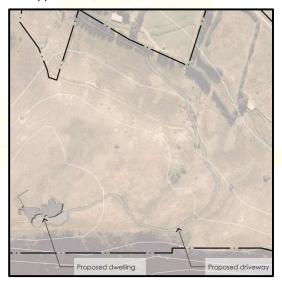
Proposed Building Platform, dwelling and upgraded driveway
